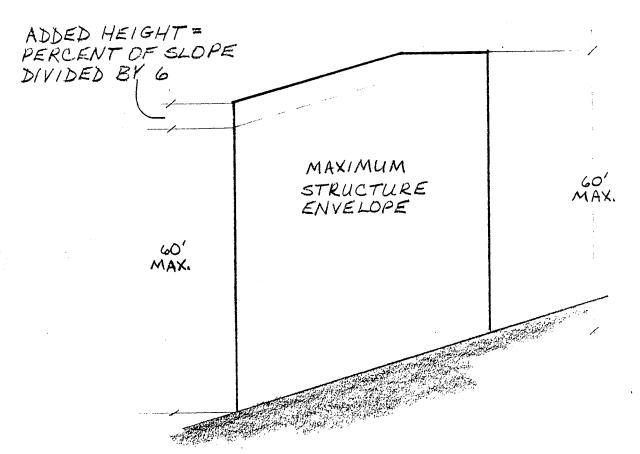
MIDRISE, HEIGHT LIMIT ON SLOPED SITES
